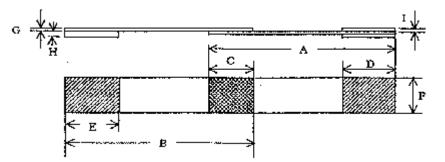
Shape and dimensions of test specimens used to test bond strength of continuous fiber sheets to steel plate
